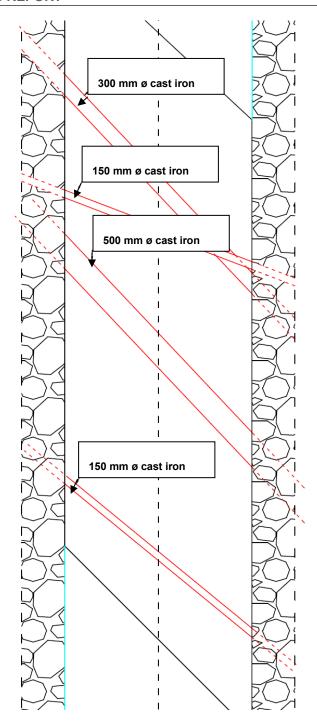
Pipe Crossing Whitechurch Road Bridge (Area 7)
